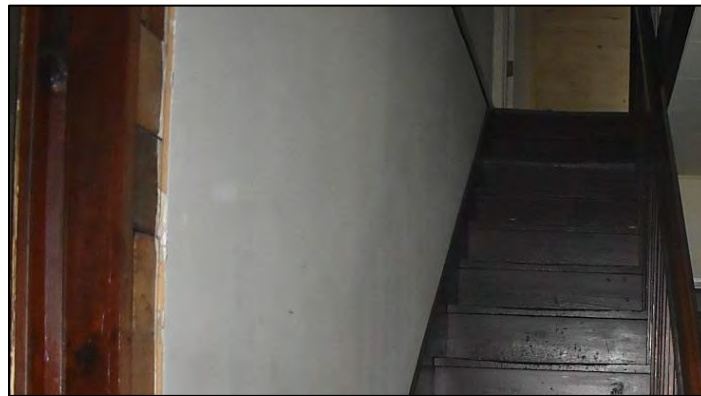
Detail of stair and largely covered flush boards at first story with exposed boards visible at second story at top of stairs
